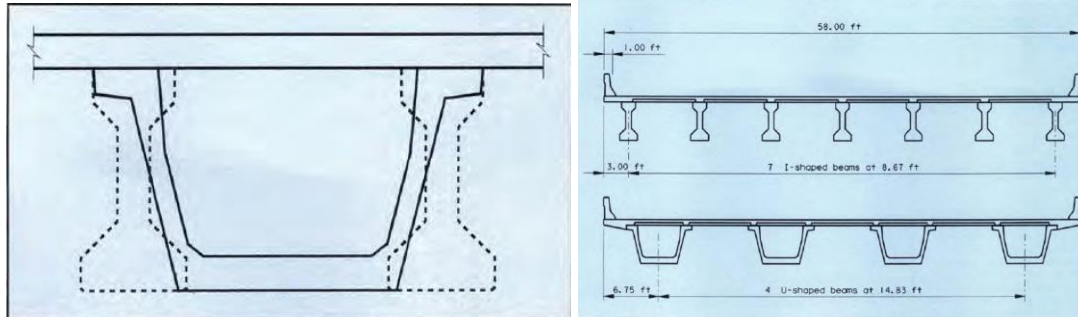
Conceptual placement of prestressed concrete girders (Ralls et al. 1993)
